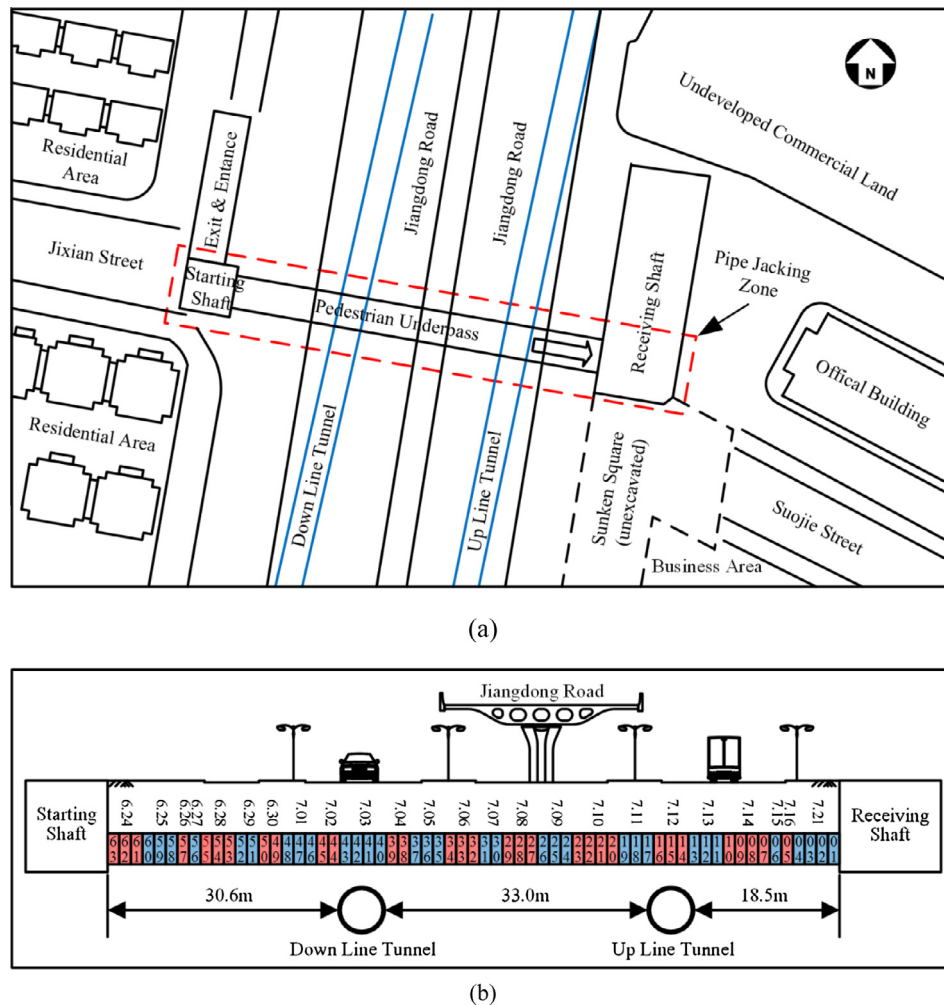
(a) Plan Layout of project and (b) section view of pipe jacking zone.
